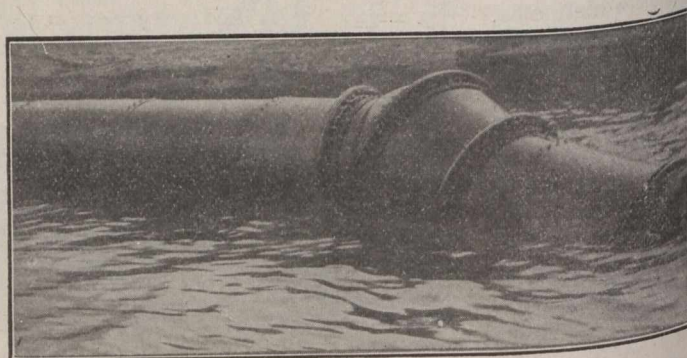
A 72-inch Flexible Joint Connected Up, and (at extreme right) An Expansion Joint.
